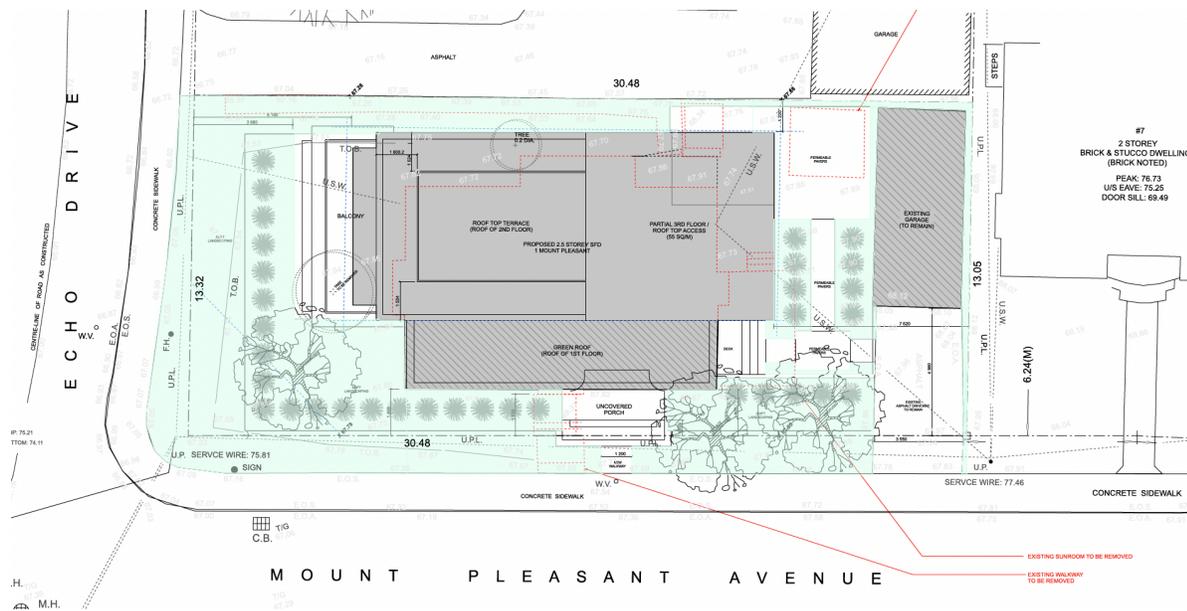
Proposed Site Plan, Colour (Source: Ardington & Associates)
